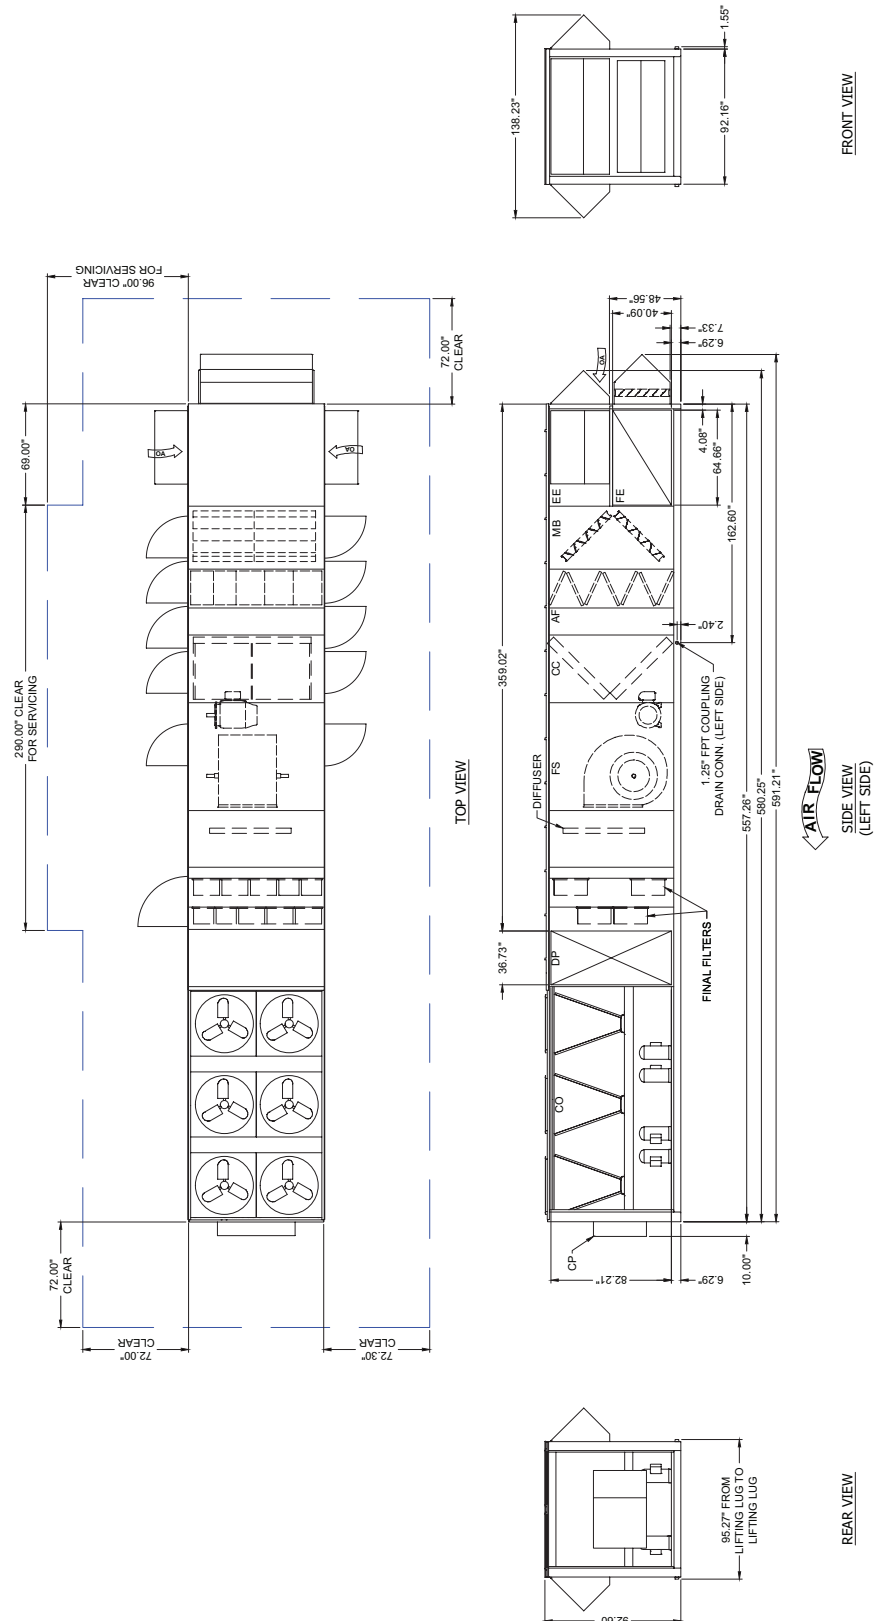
GENERAL ARRANGEMENT DRAWING
